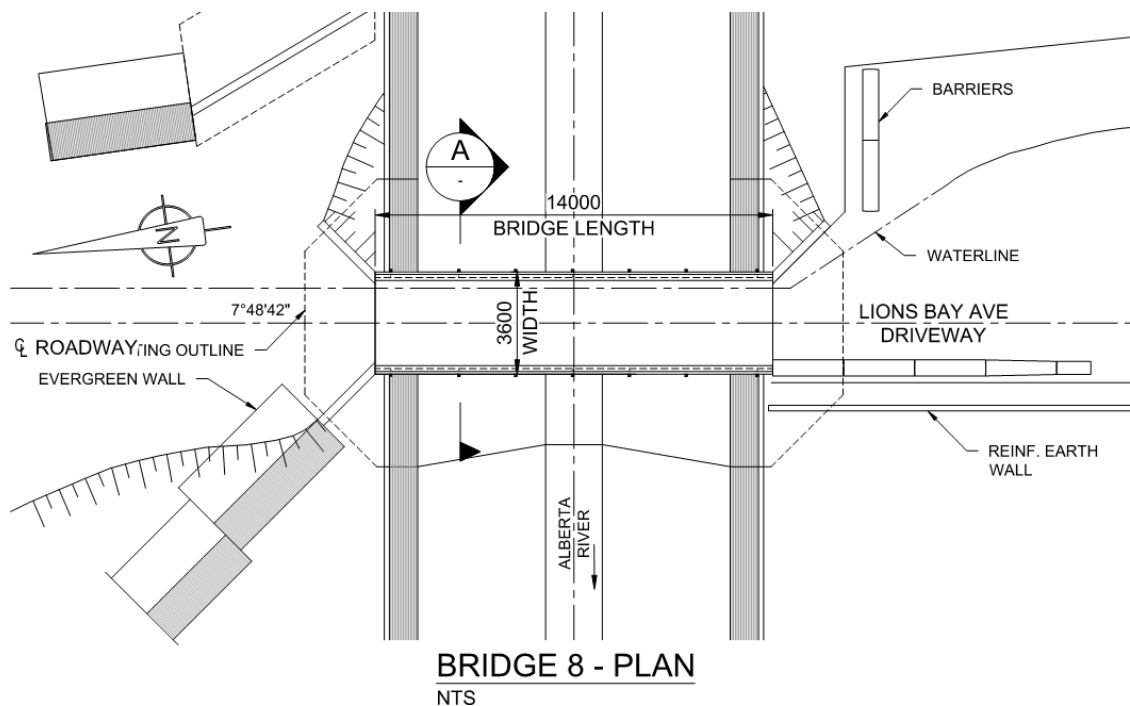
Lions Bay Avenue Bridge over Alberta Creek (Driveway) – Plan
